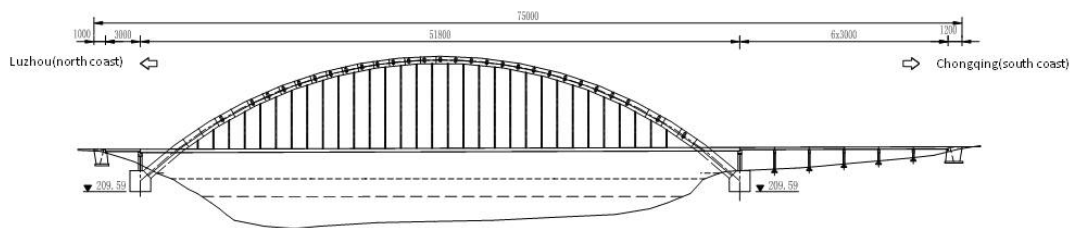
General layout of the steel-boxed arch bridge of scheme 2
